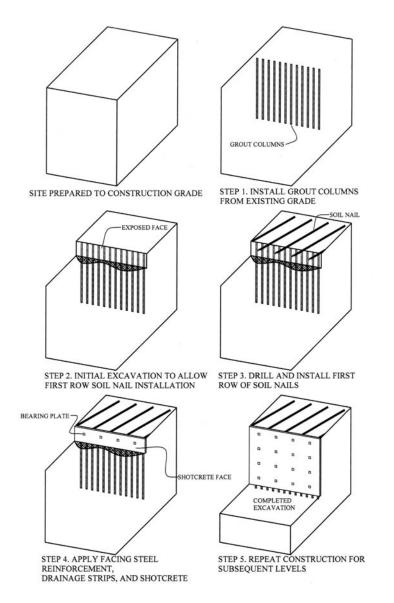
Soil Nail Earth Retention Incorporating Grout Columns Construction Sequence
